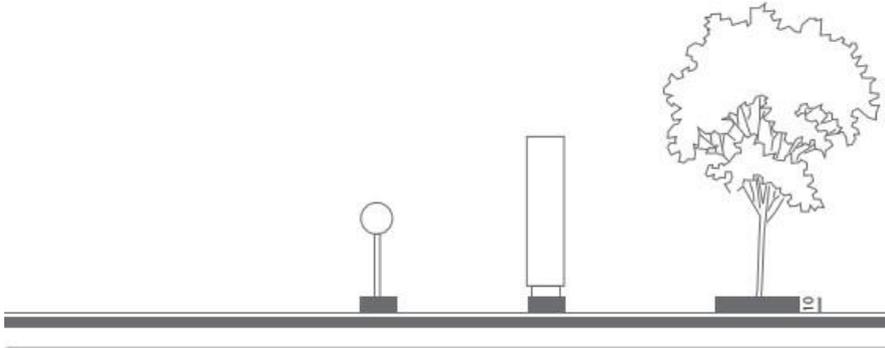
Elevated platforms around trees and other intentional elements on pavements (World Disability Foundation, 2012).
